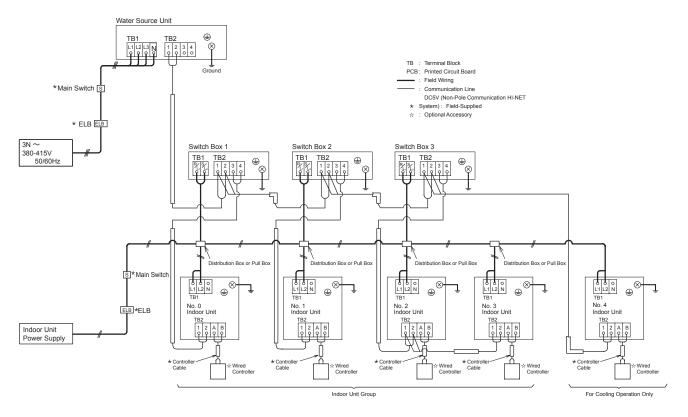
Layout for Electrical Wiring Connection (Heat Recovery System)
